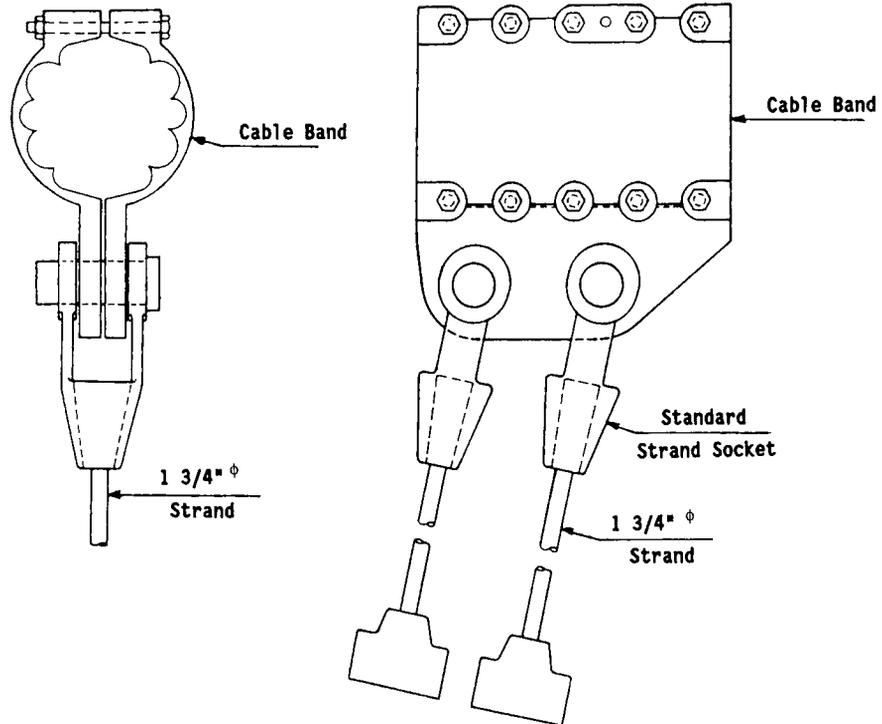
Cable band and suspender detail used for the Hennepin Avenue Bridge.
